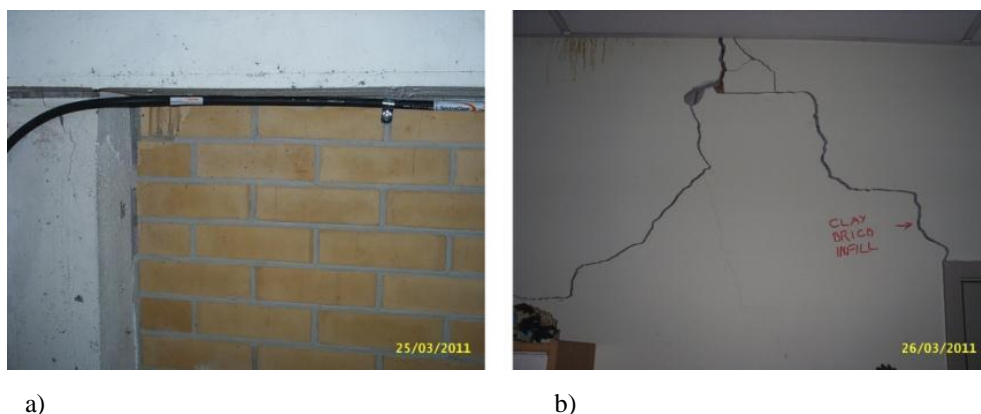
Observed damage on masonry infills after the 22nd February 2011 Christchurch earthquake: a-b) Diagonal cracking
